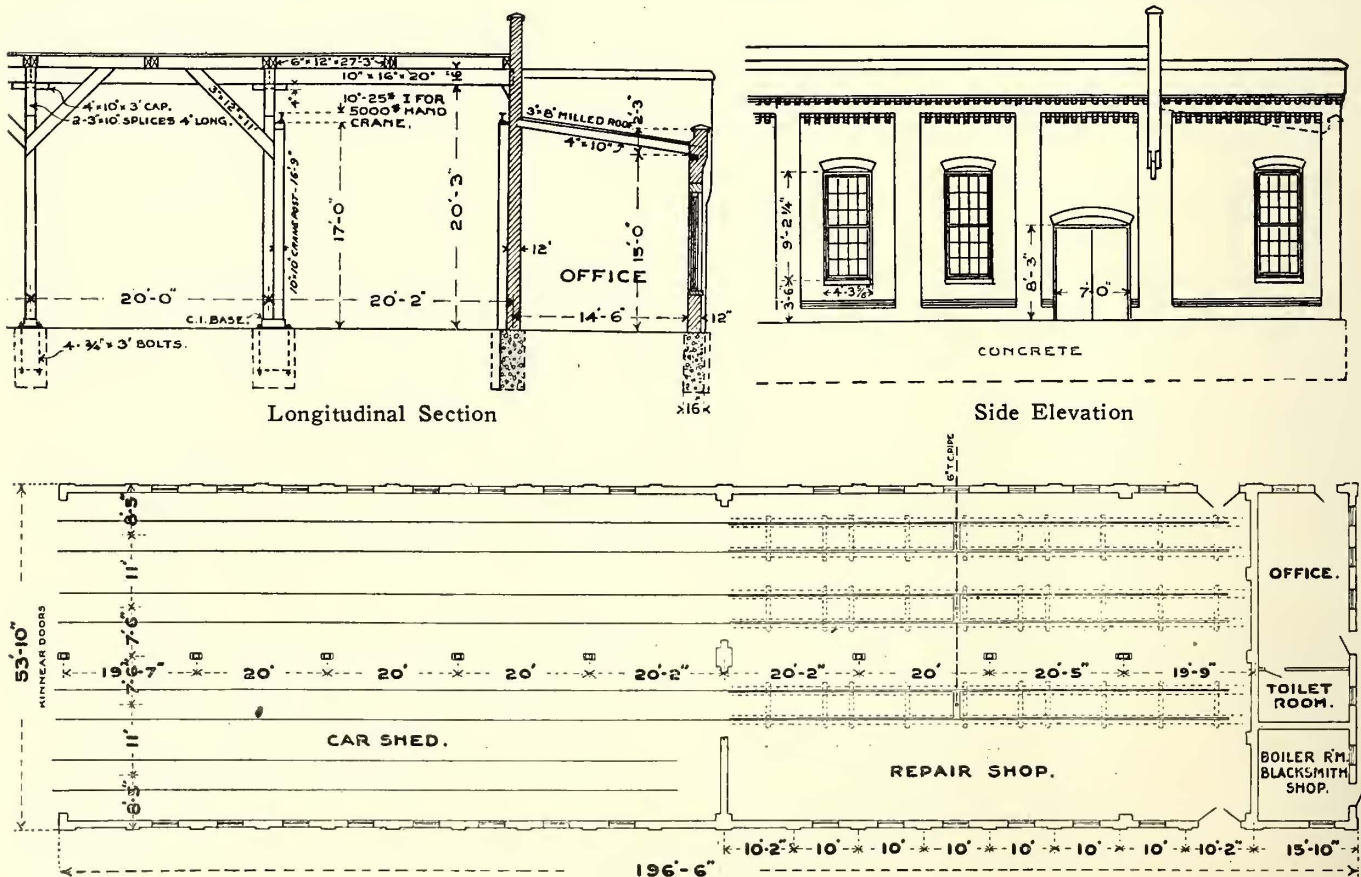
Plan of Car House, with Quarters for Operating and Repair Forces
